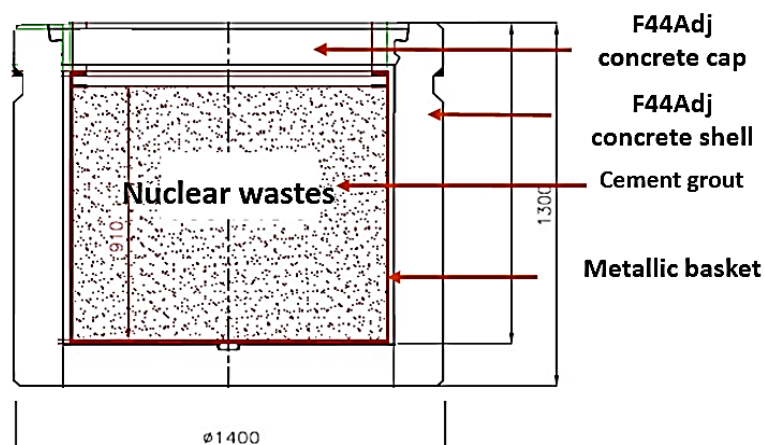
Transversal section of the C1PG^{SP} package. Indicated dimensions are in mm.
